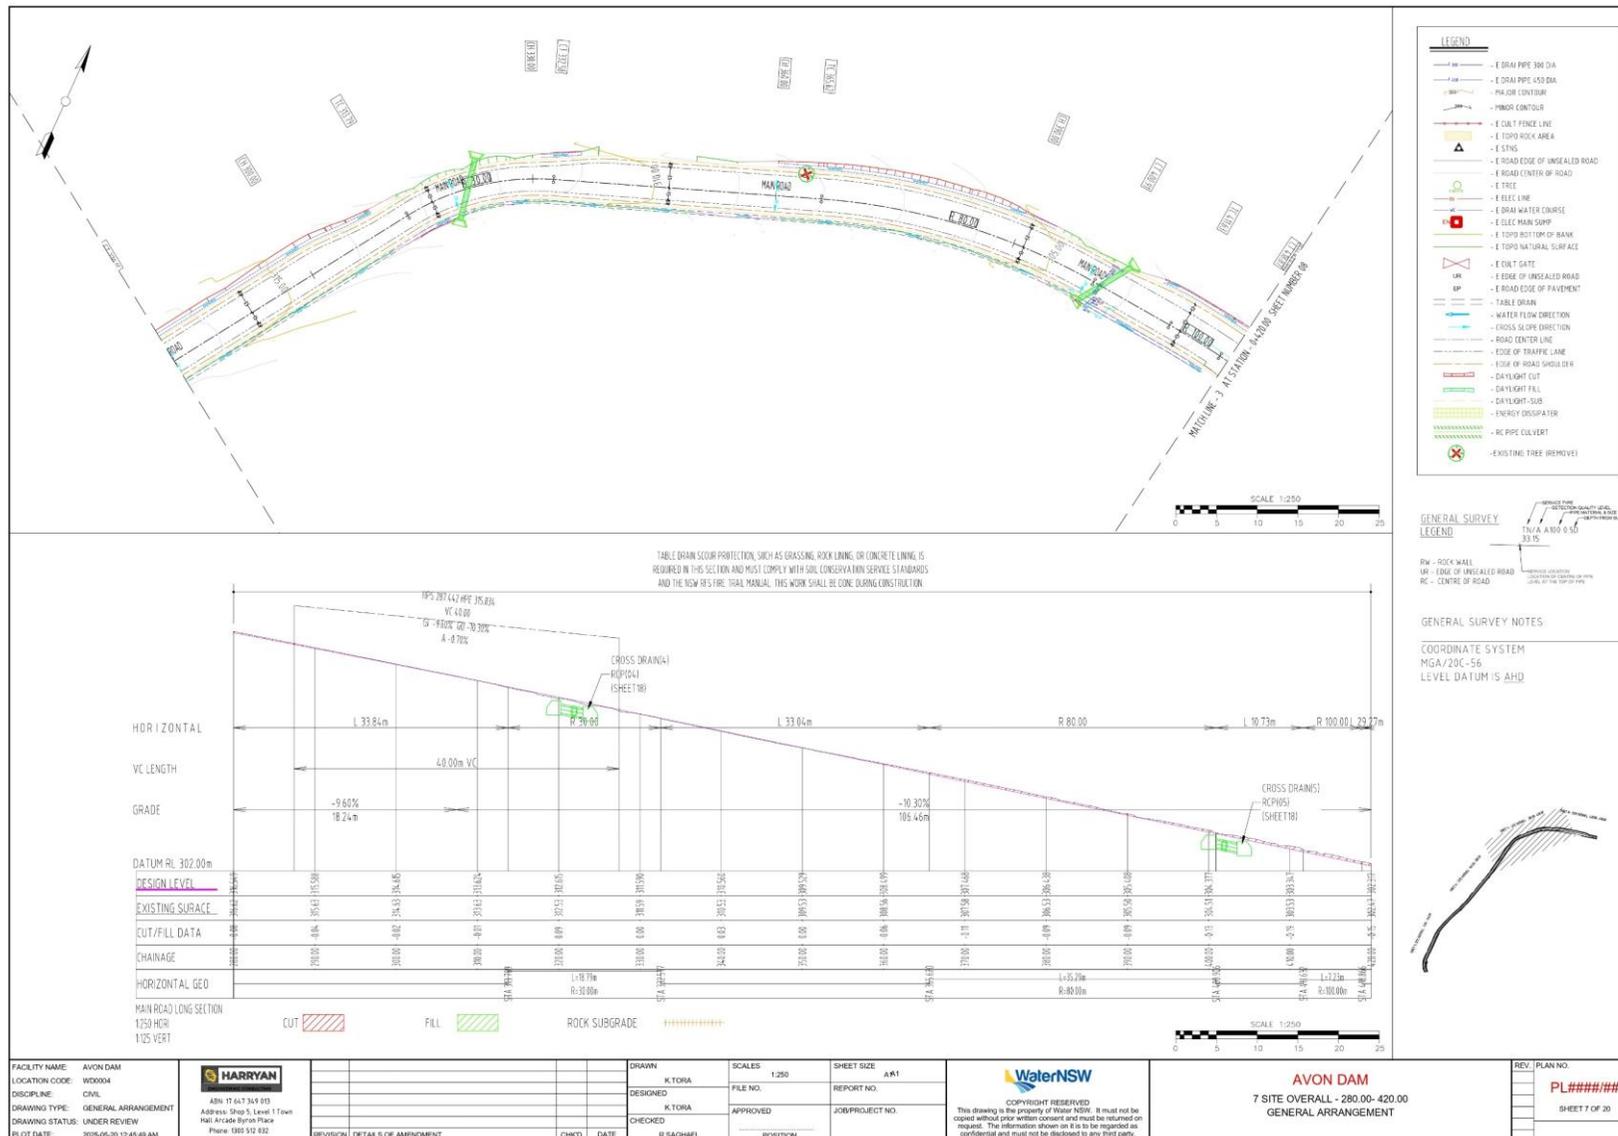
Map ID Section 1 (Main Road) proposed works overview Sheet 7 (Source: Water NSW, May 2025)
